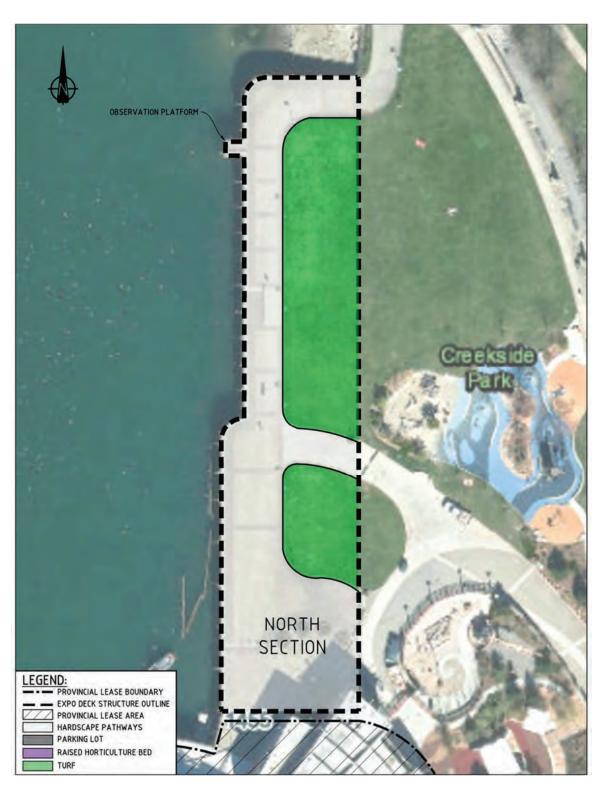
Plan View of Topside Landscape Surfacing, North Section
